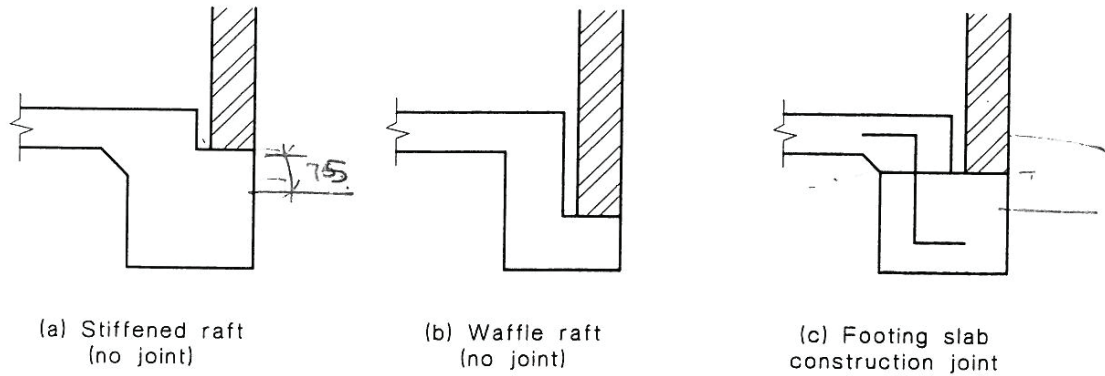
EXAMPLES OF FOOTING SYSTEMS REQUIRING NO JOINT TREATMENT
